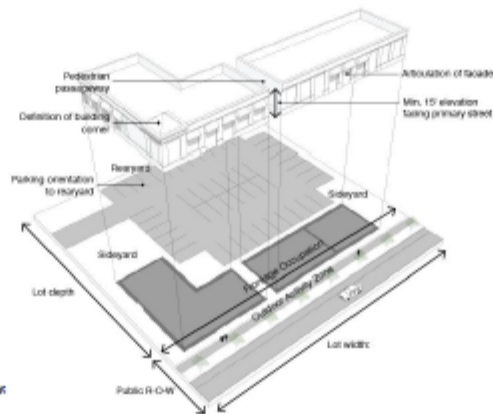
BUILDING AND SITE TYPES
